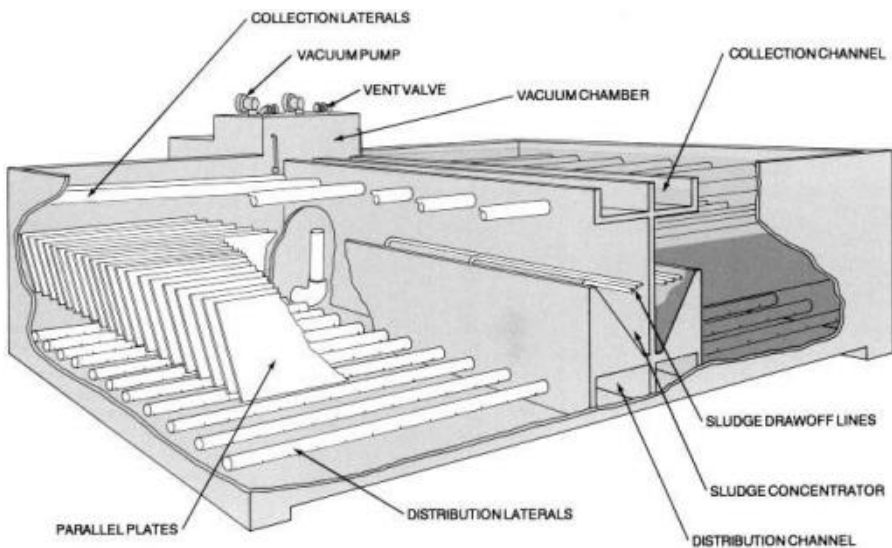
An exploded view of the superpulsator clarifier illustrating typical components and configuration (Courtesy of Infilco Degremont, Inc.)
